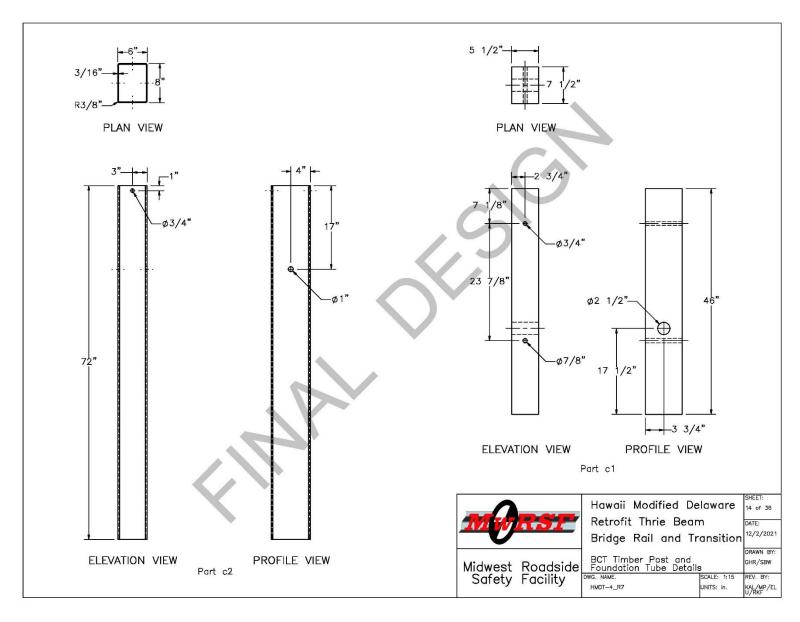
BCT Timber Post and Foundation Tube Details, Test No. HMDT-4
